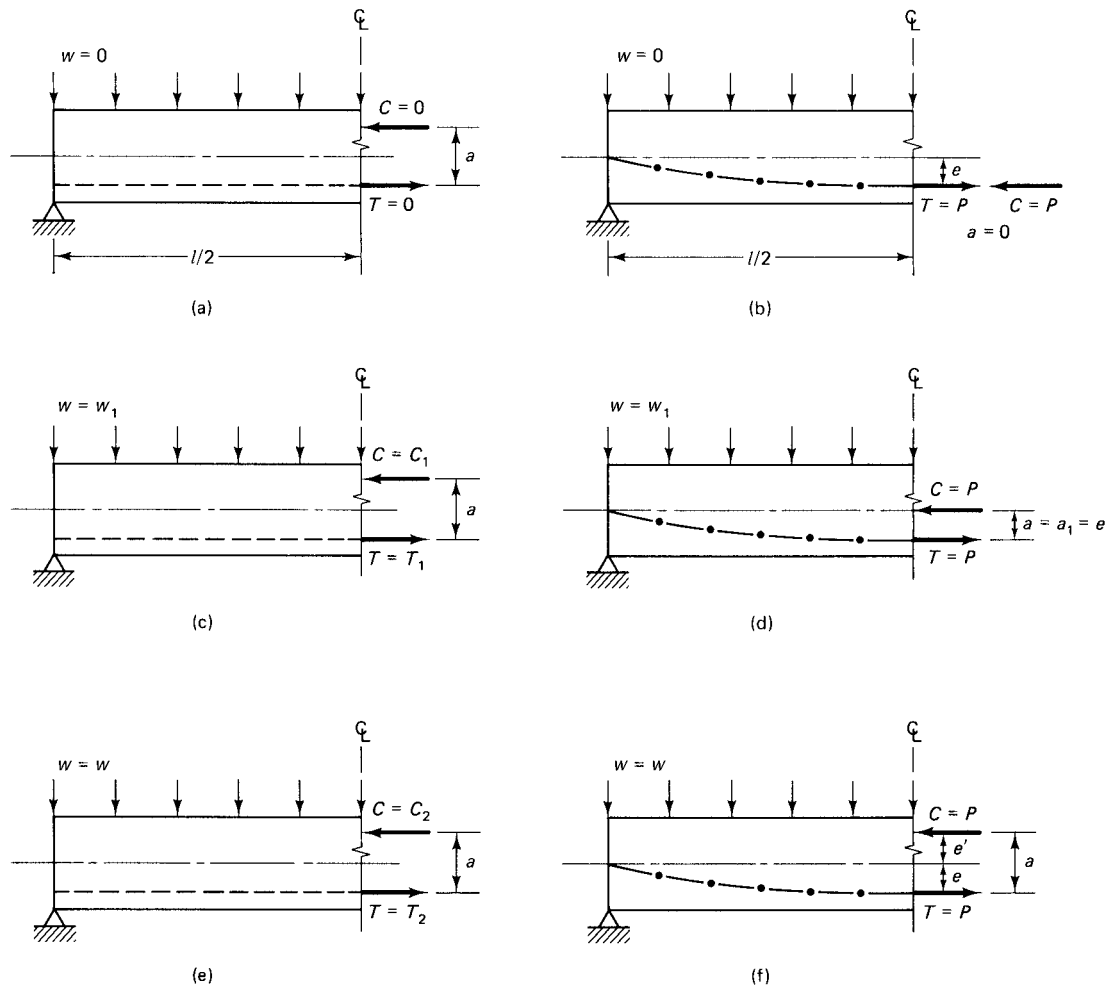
Comparative free-body diagrams of a reinforced concrete (R.C.) beam and a prestressed concrete (P.C.) beam. (a) R.C. beam with no load. (b) P.C. beam with no load. (c) R.C. beam with load w_1 . (d) P.C. beam with load w_1 . (e) R.C. beam with typical load w . (f) P.C. beam with typical load w .
